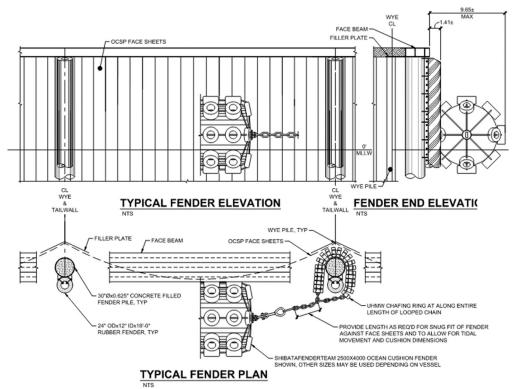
Permanent Pile Fenders with Removable Foam Filled Fenders – Plan and Elevation Views
